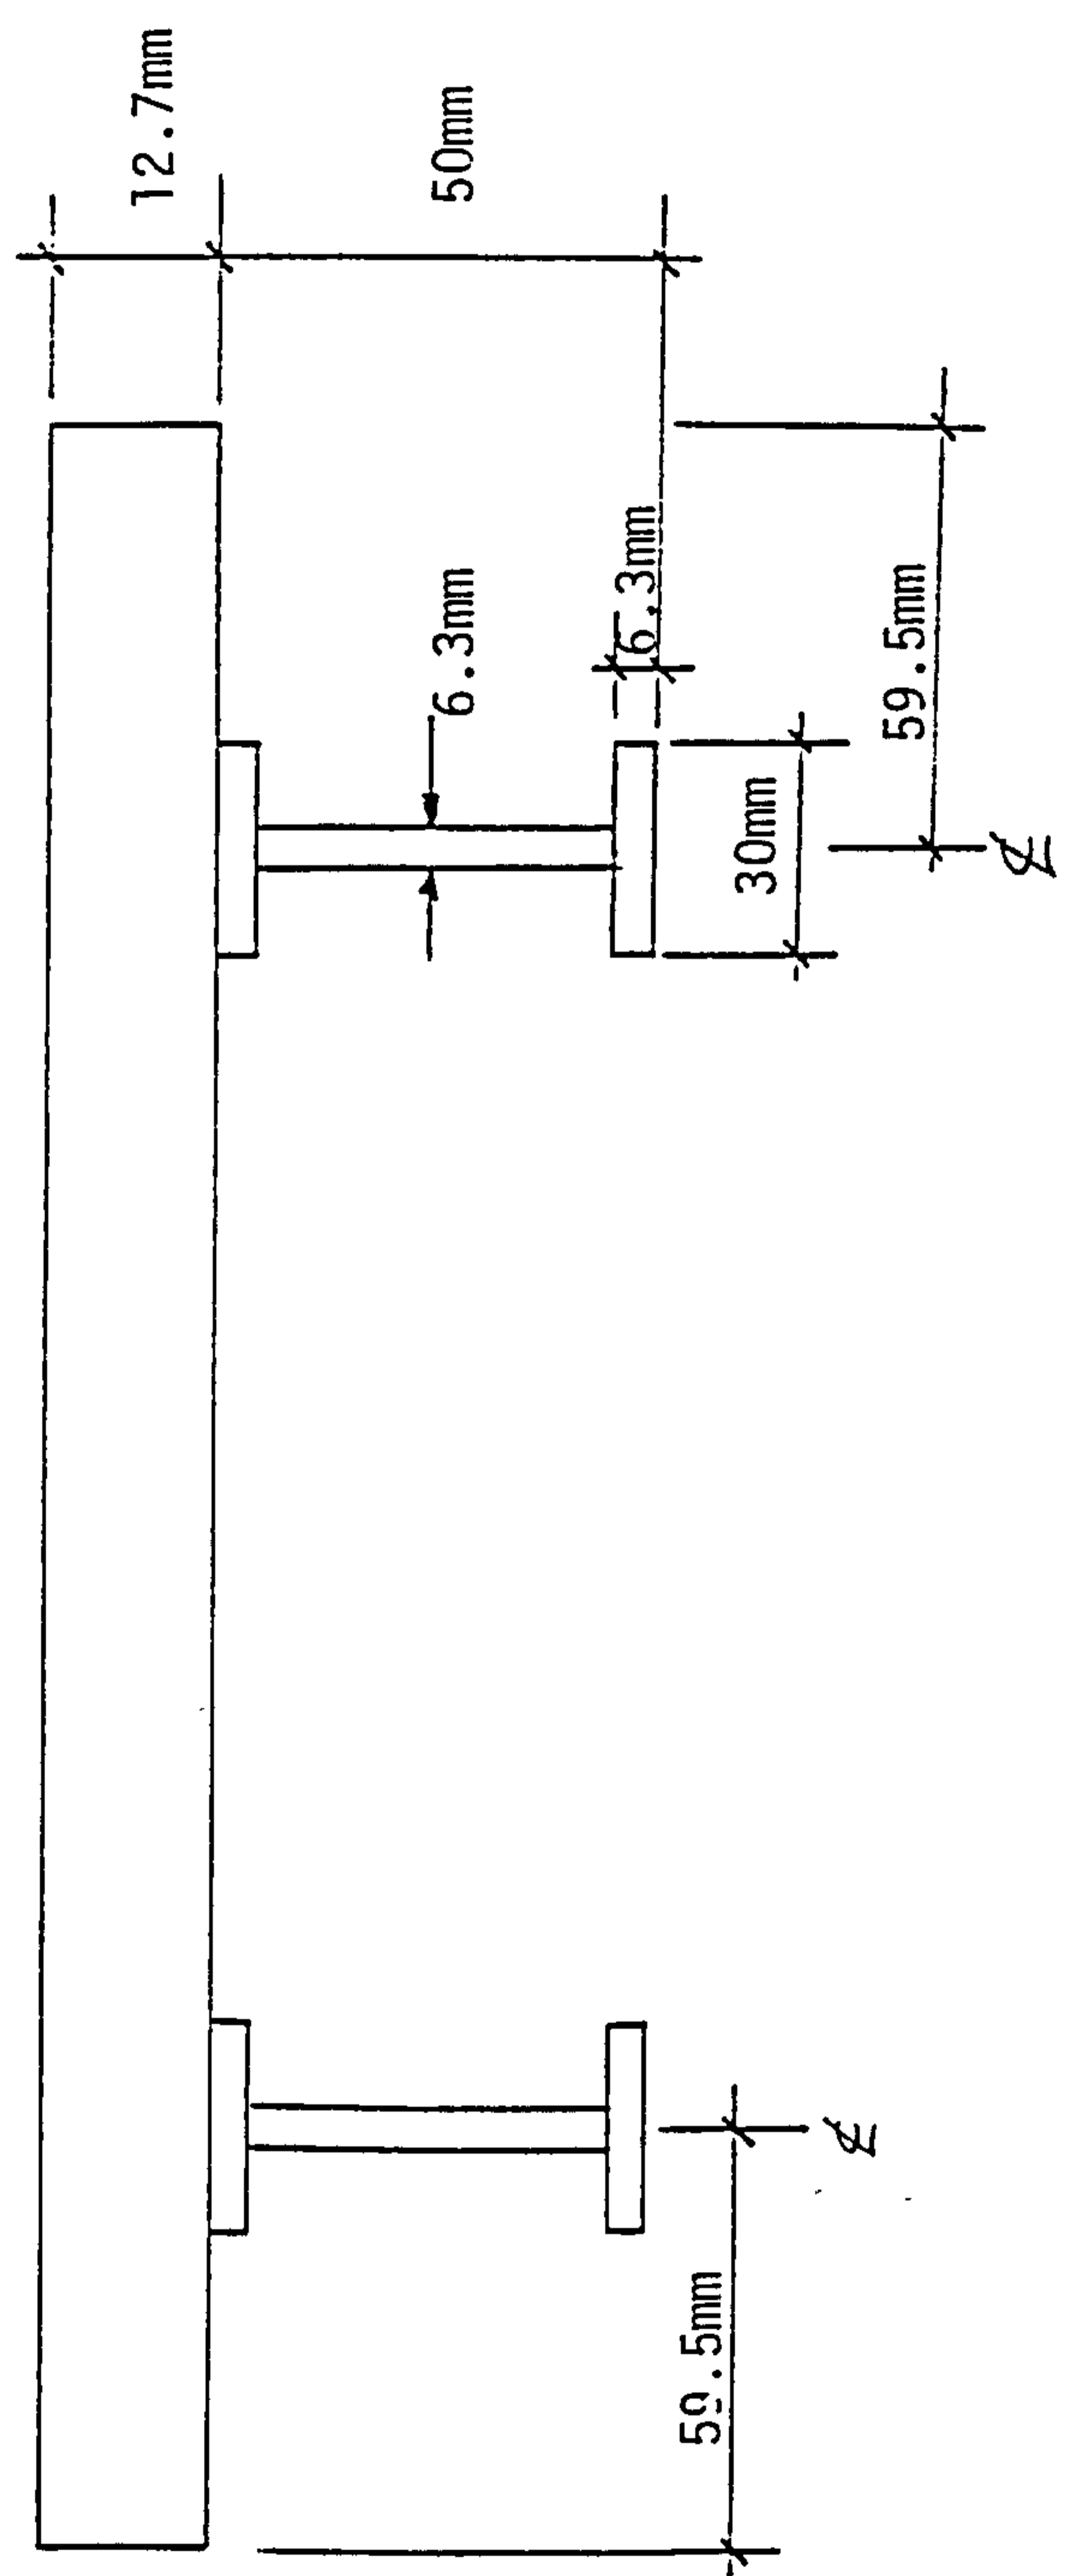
SECTION A-A OF THE MODEL BRIDGE
